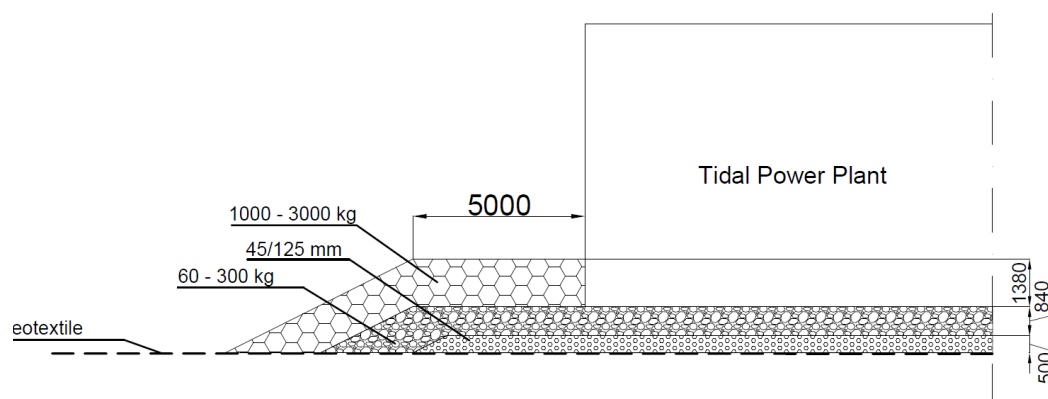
RUBBLE FOUNDATION BED TRANSVERSE CROSS SECTION
